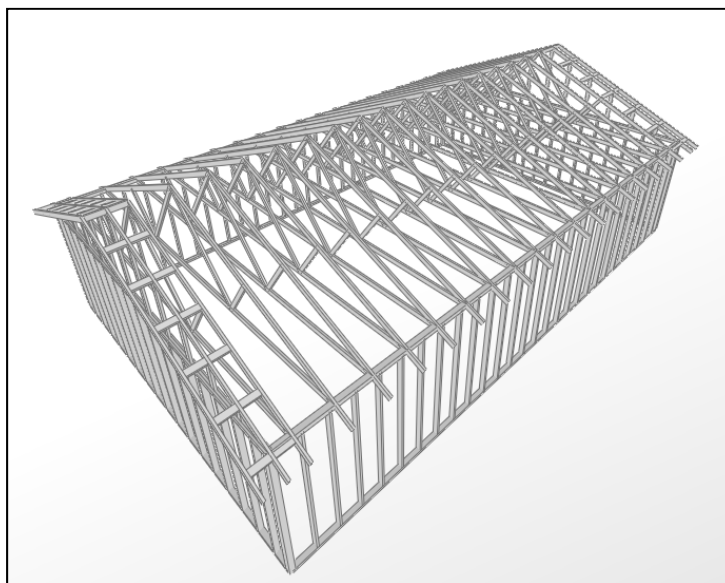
Rectangular Index Building for Uplift Investigation – rectangular building with no openings, no interior walls and no GWB. Walls and gable-ends are fully sheathed on the exterior with plywood.
